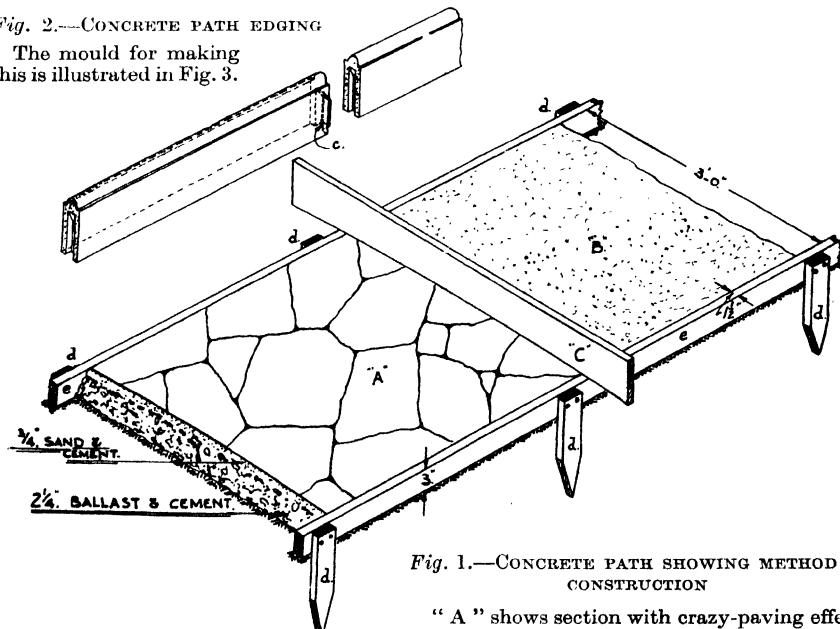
CONCRETE PATH SHOWING METHOD OF CONSTRUCTION
